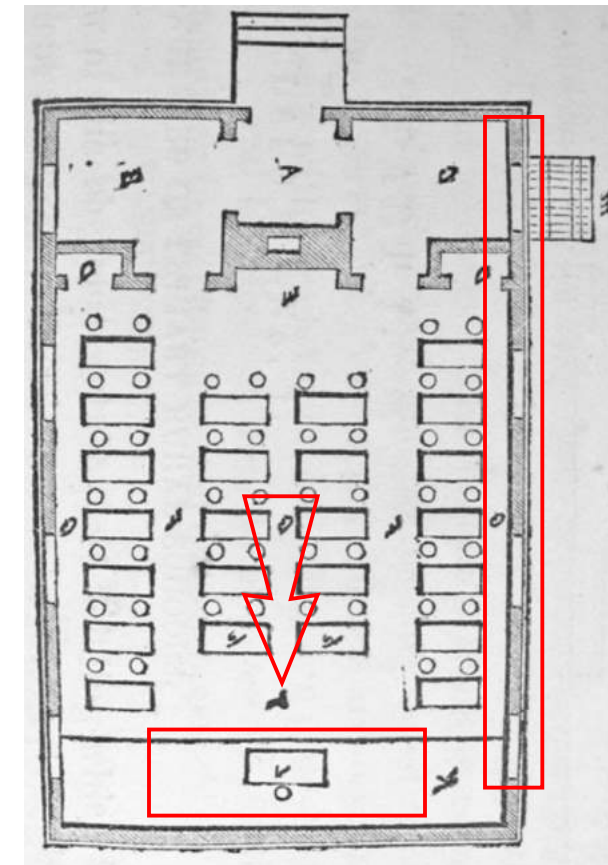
"COMMON SCHOOL" FLOOR PLAN
